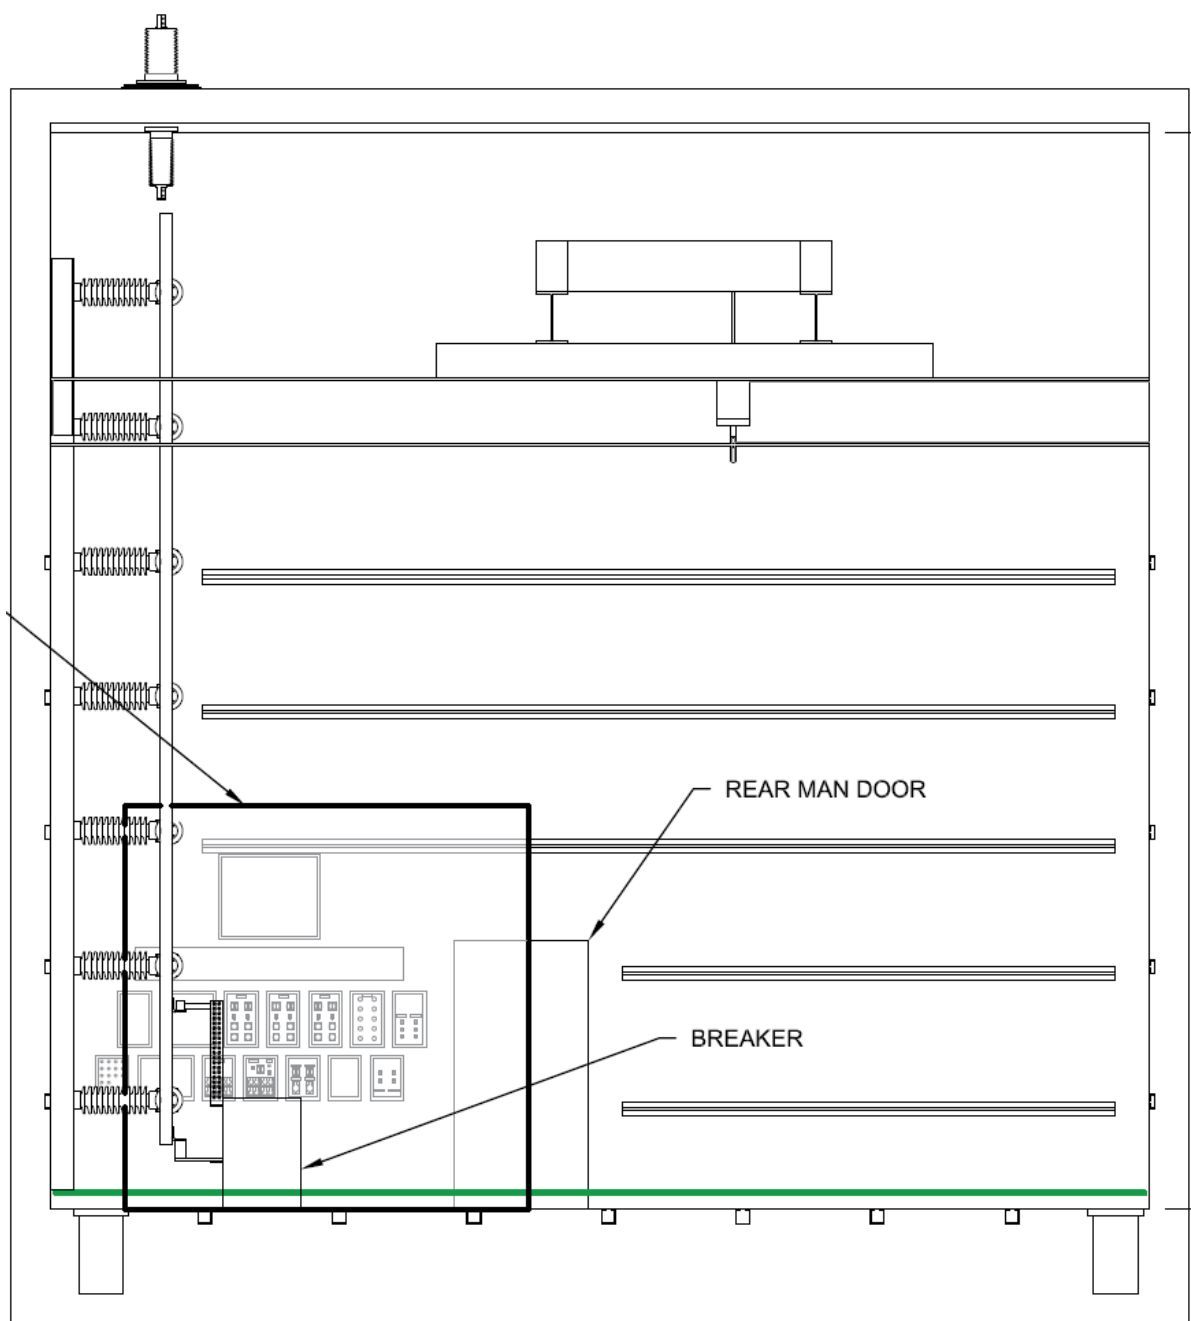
Elevation view of Test Cell #9. Breaker shown in drawing is part of KEMA protection system and is not the open box.
